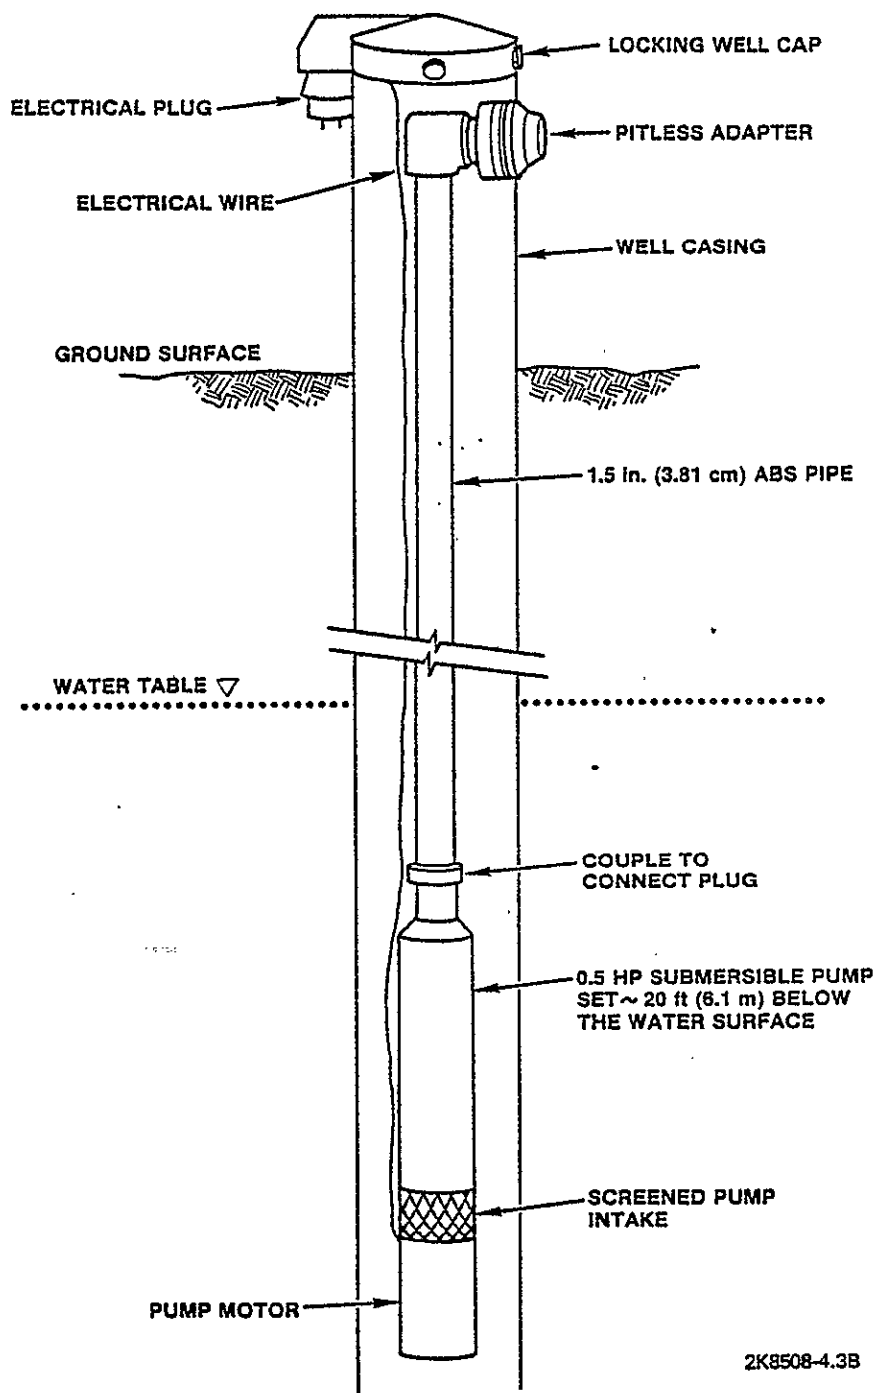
Cross-Sectional View of a Ground-Water Monitoring Well with Pump.
